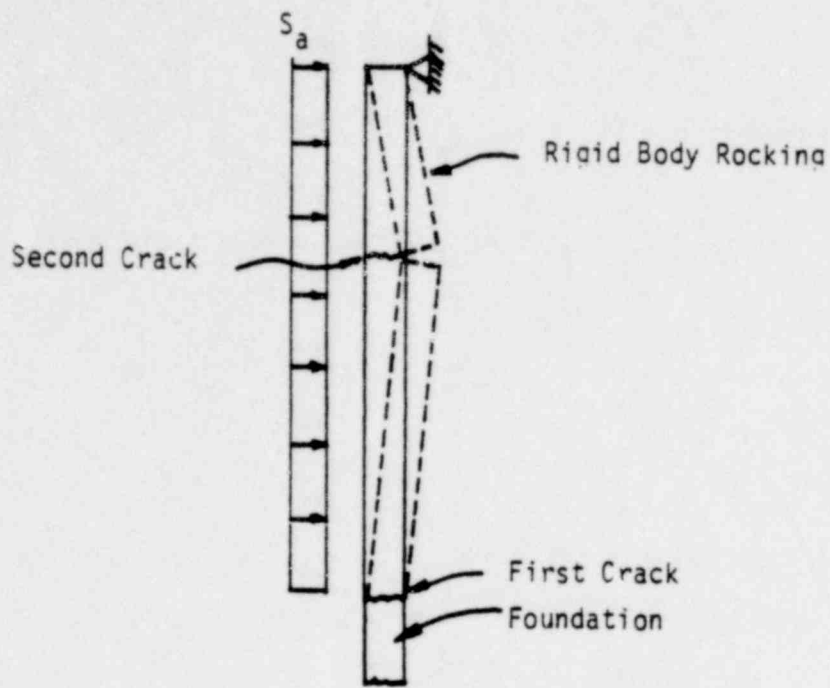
RIGID BODY WALL ROCKING FAILURE MODE ASSUMING RIGID ROOF FRAMING
